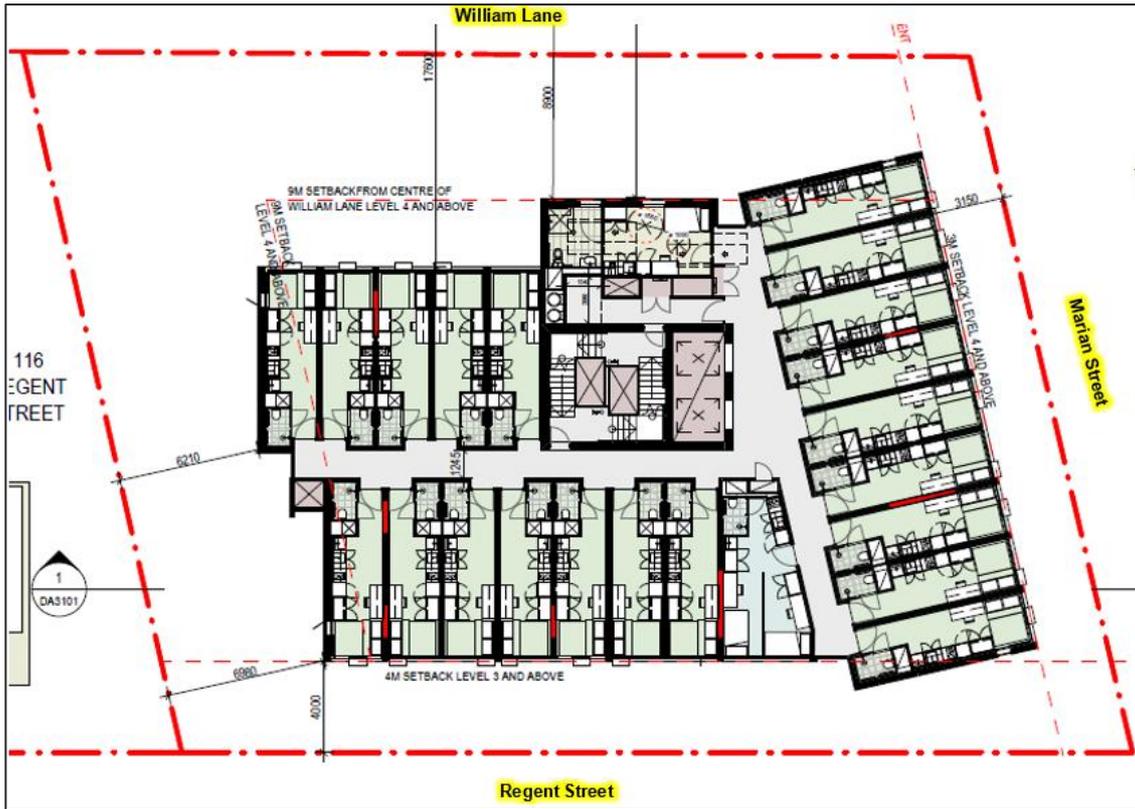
| Typical upper floor plan (source: Addendum RRTS)
